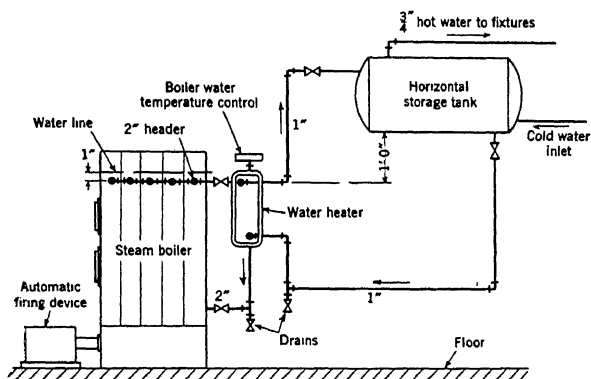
INDIRECT WATER HEATER MOUNTED ON SIDE OF BOILER
